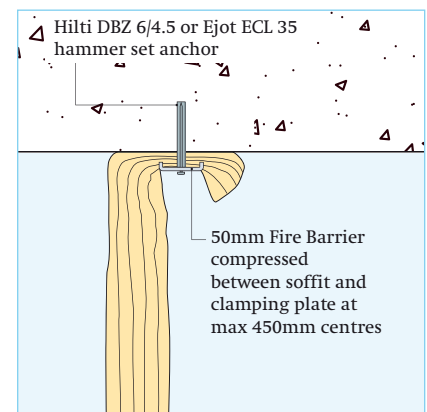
Alternative fixing to flat soffit or perimeter, appropriate to barriers with a shallow drop
